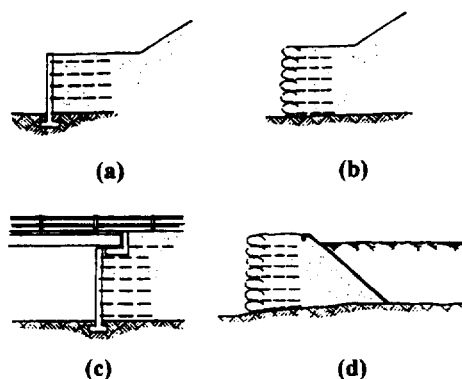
Some examples of reinforced soil walls: (a) concrete faced retaining walls (b) "wrap-around" faced retaining wall (c) bridge abutment and (d) dam (after Bonaparte et al, 1985)
